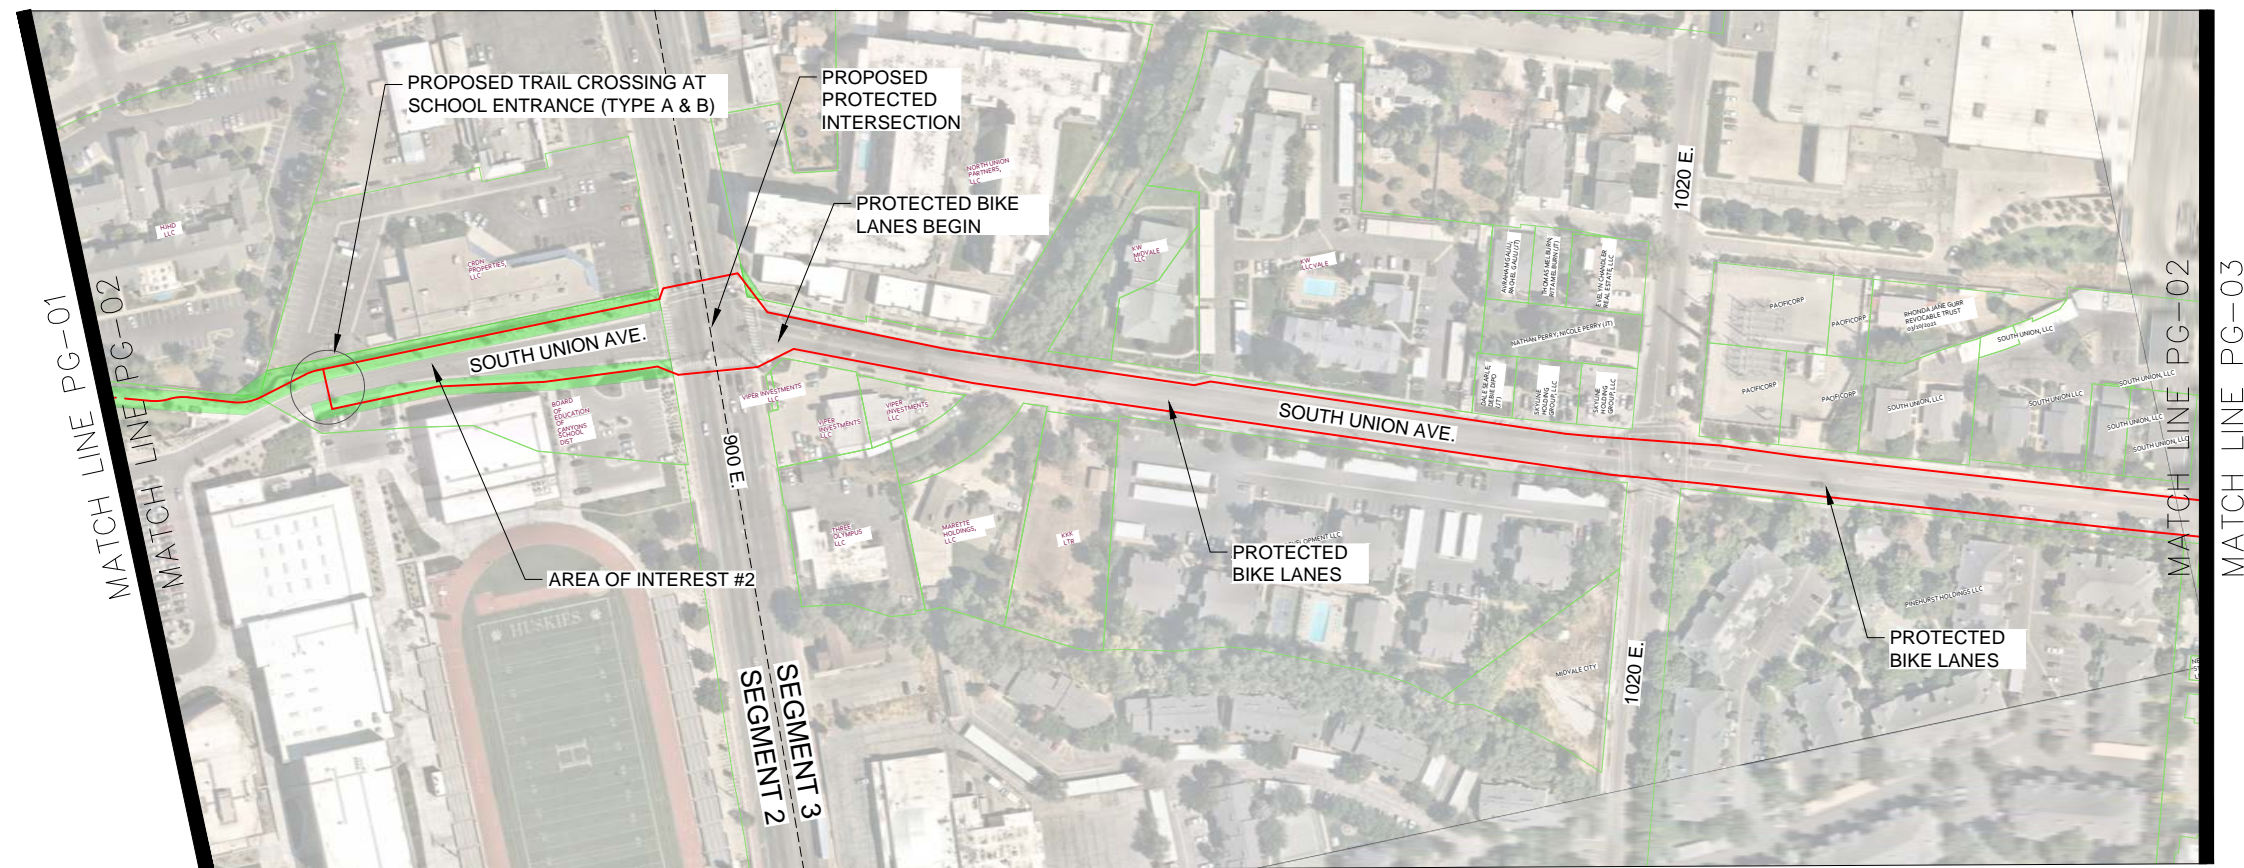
Proposed alignment along the East Jordan Canal, sheet 2.
